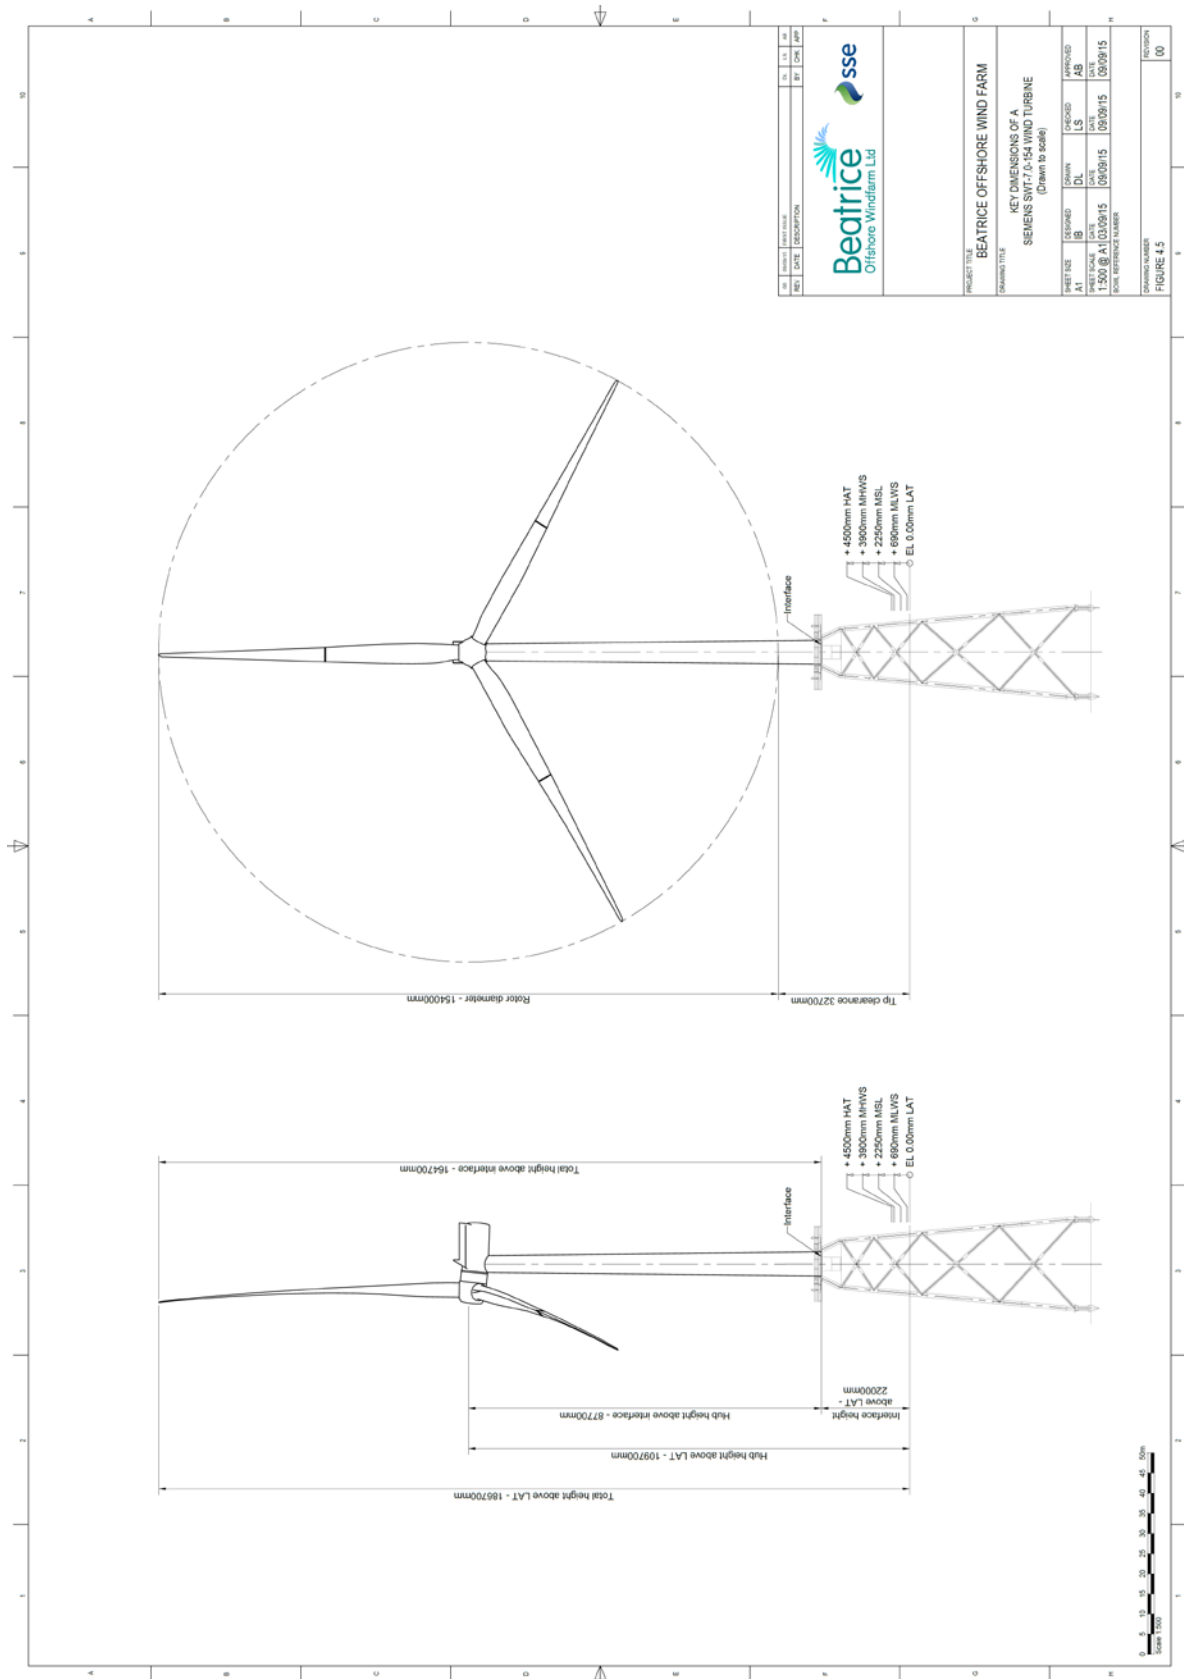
Key dimensions of a Siemens SWT-7.0-154 wind turbine
